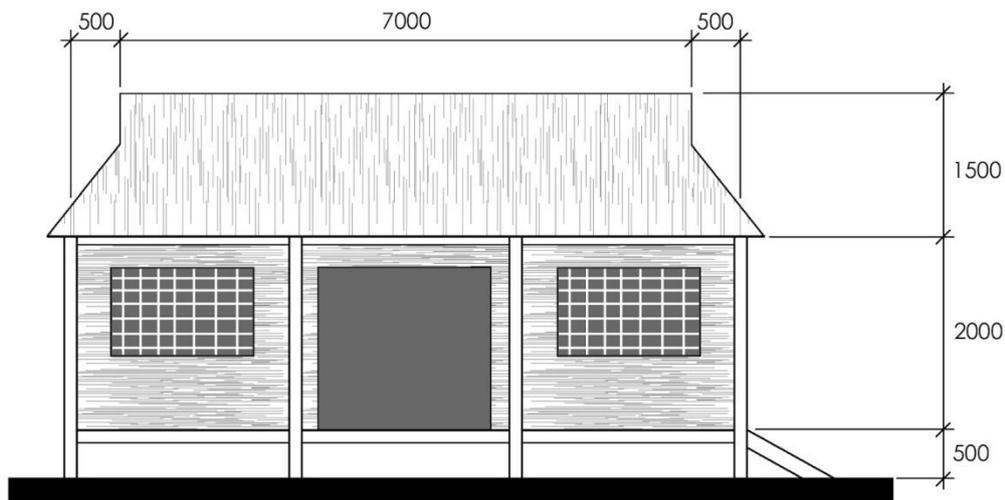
Front elevation of typical An Minh house, adapted from Van, N.K 2012
